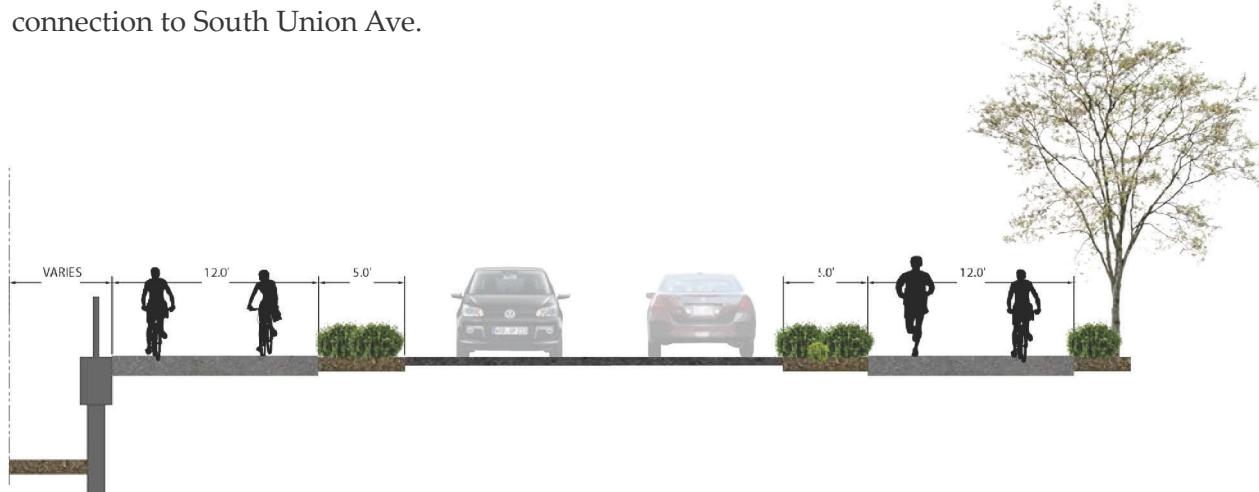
East Jordan Canal Trail typical sections of trail at Hillcrest High School entrance.
